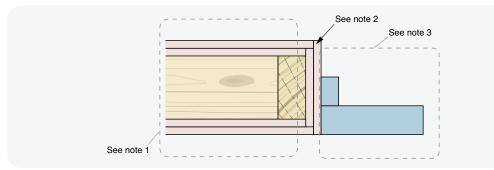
Access panel in a fire-protected timber-framed wall.
